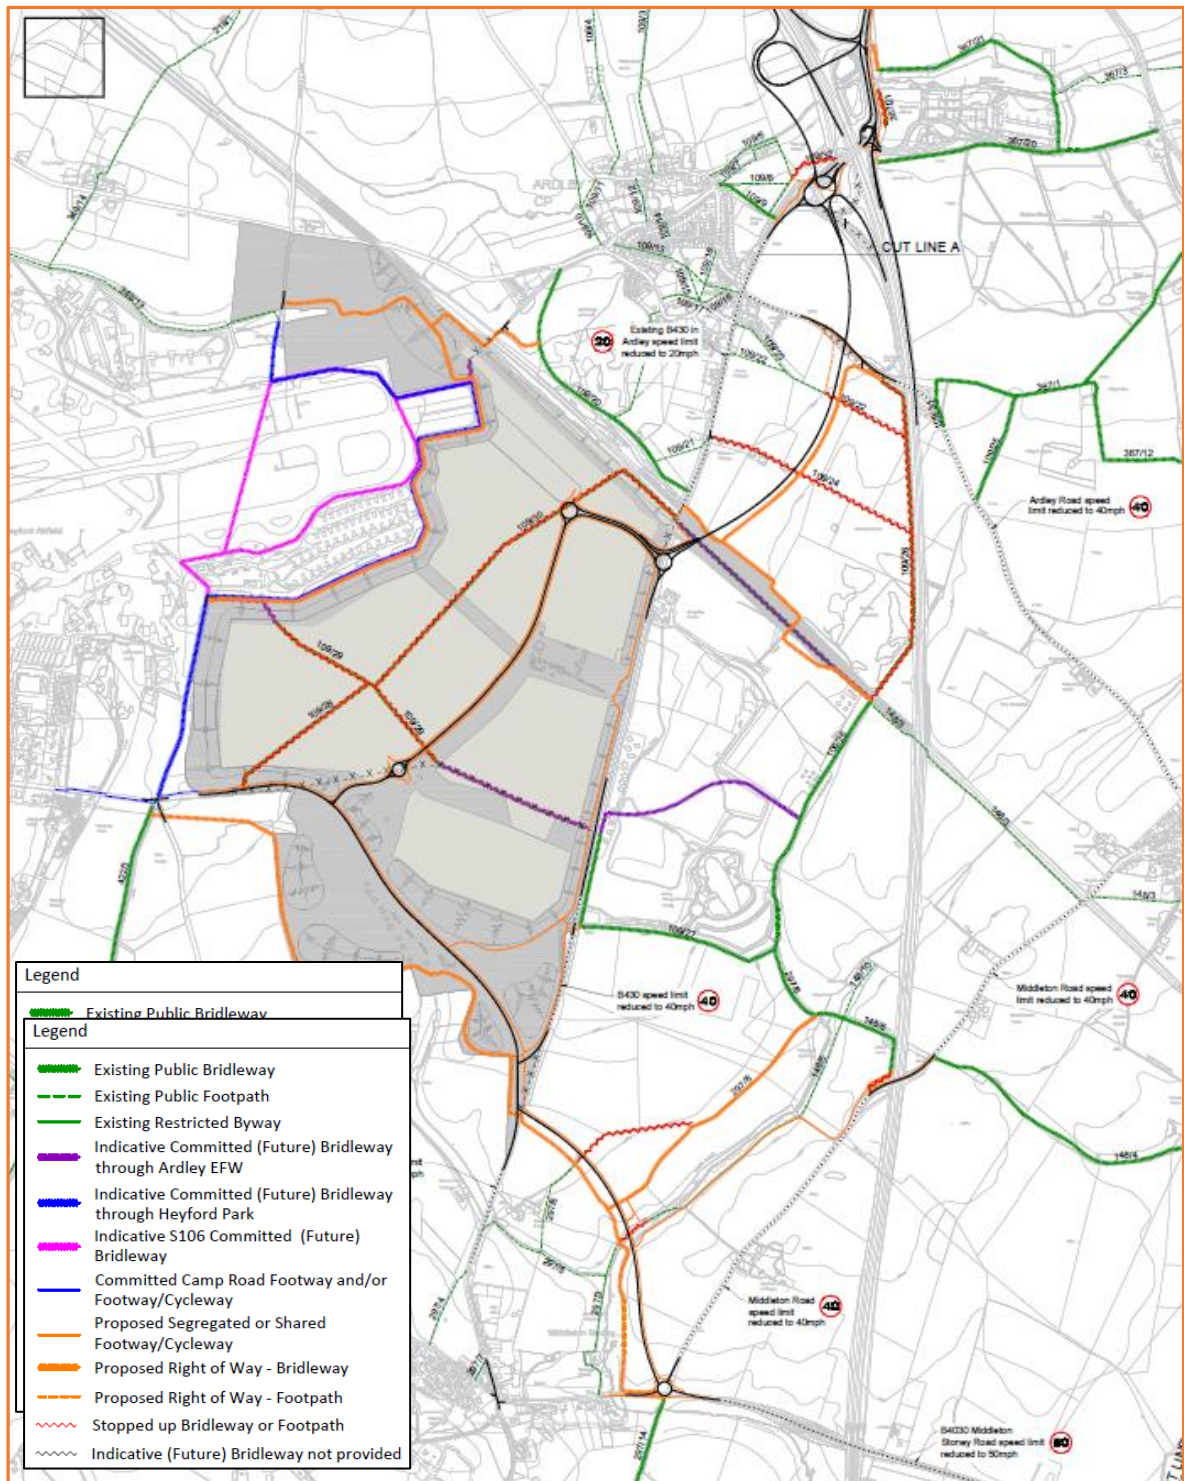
Footway/Cycleway and PRoW Strategy Plan (extract of drawing ADC1794-DR-042, see Appendix B for full details)
